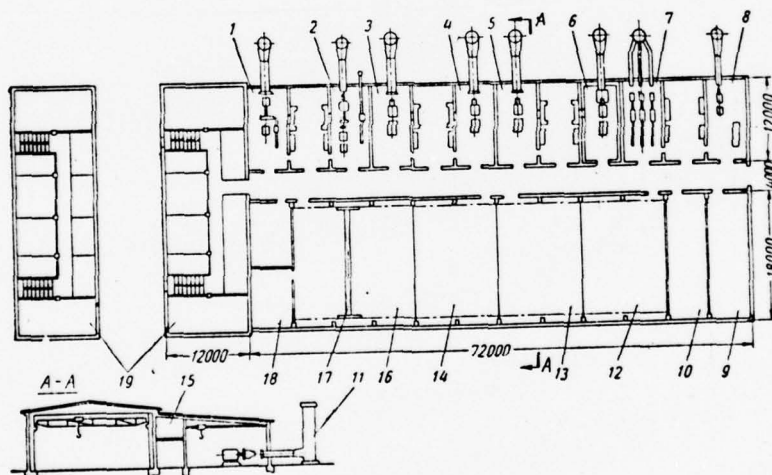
Diagram of planning of gas-dynamic testing laboratory of gas turbines: 1 - stand of gas turbines; 2 - stand of compressors, blasting of blades, grates it puffed; 3, 4 and 5 - stand of gas turbine engines; 6 - unit for special climatic testings of engines; 7
